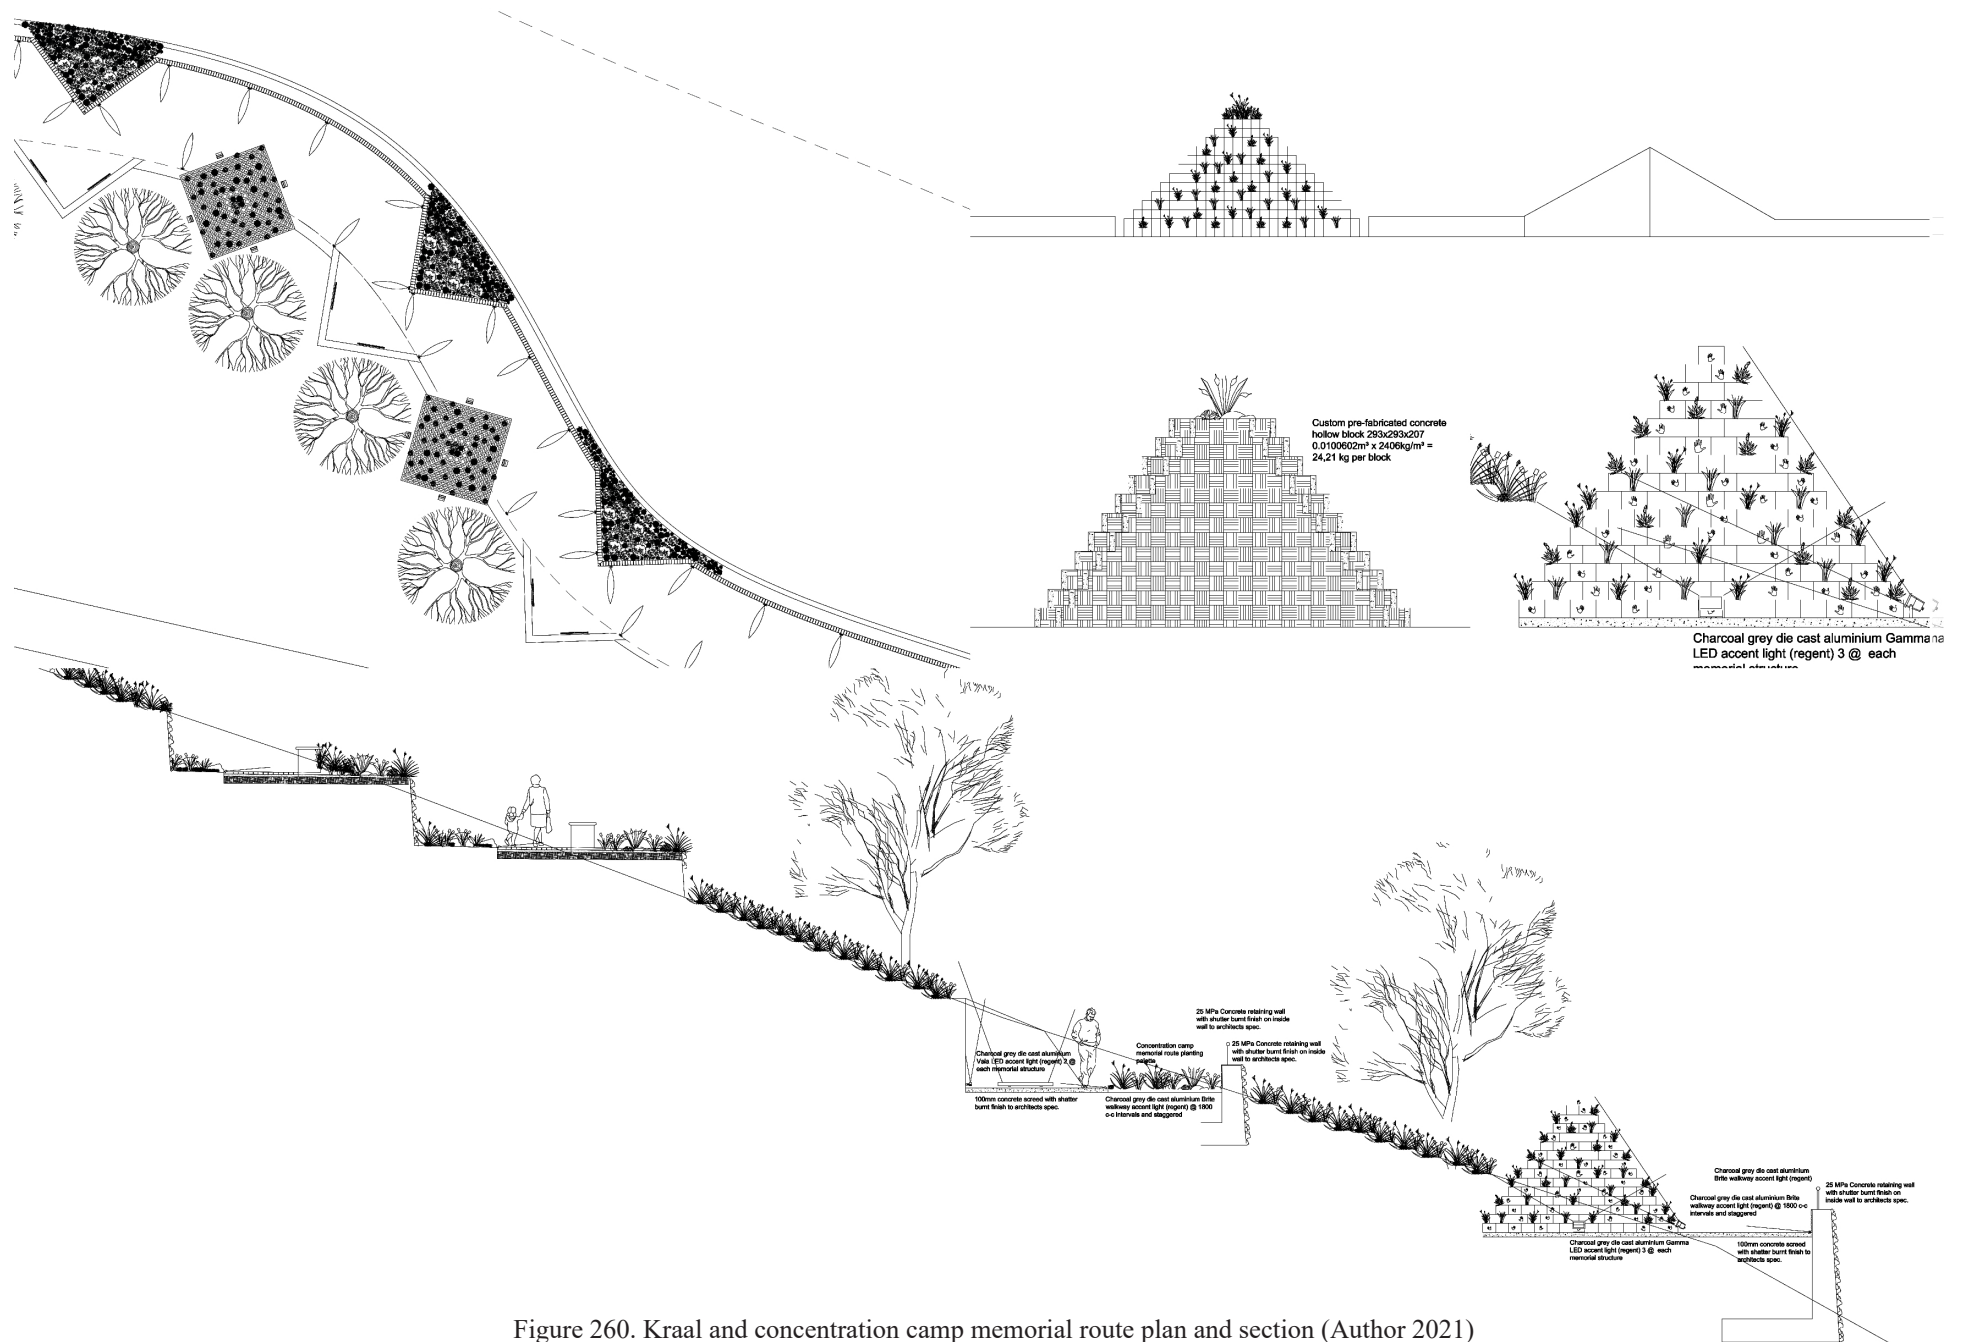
Kraal and concentration camp memorial route plan and section (Author 2021)
